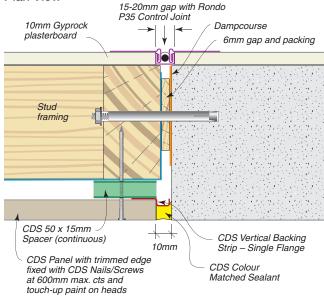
Junction of CDS with Offset Masonry Wall – Plan View
